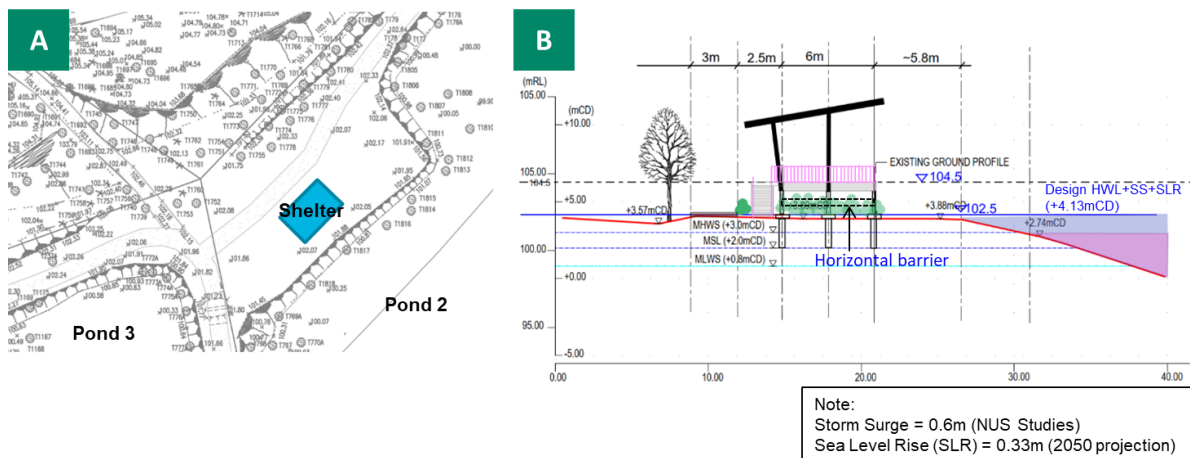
(A) Location of proposed shelter, (b) Section view of shelter.
